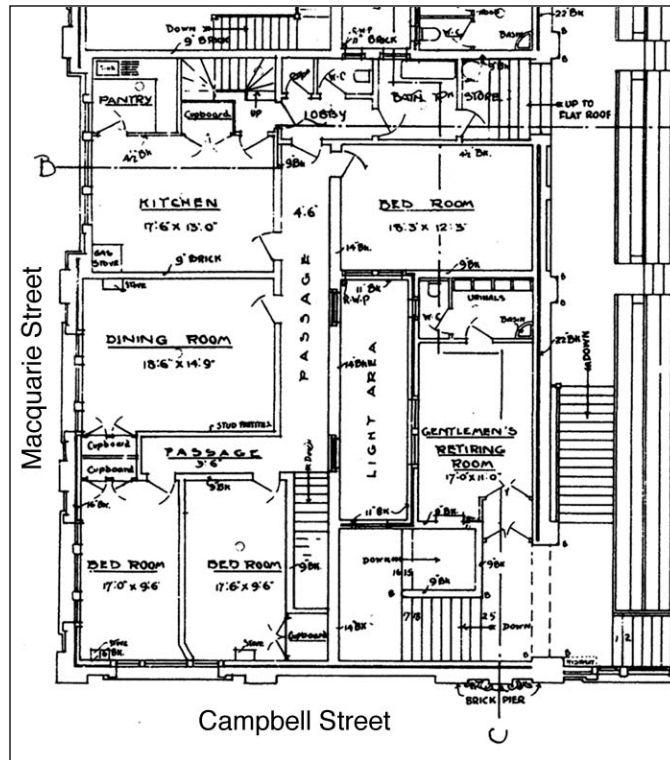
Detail of 1914 plans showing the caretaker's flat (HCC Drawing A7³).
